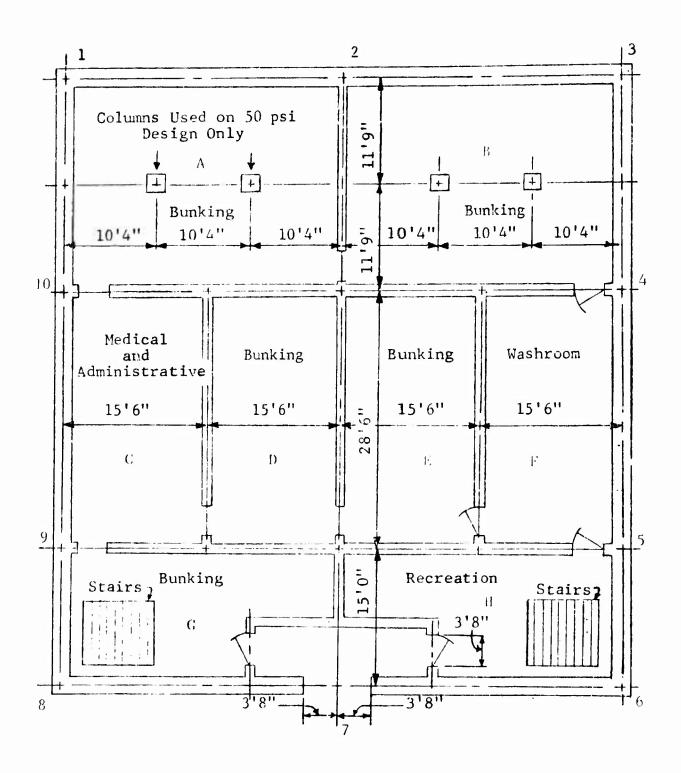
LOWER LEVEL FLOOR PLAN
